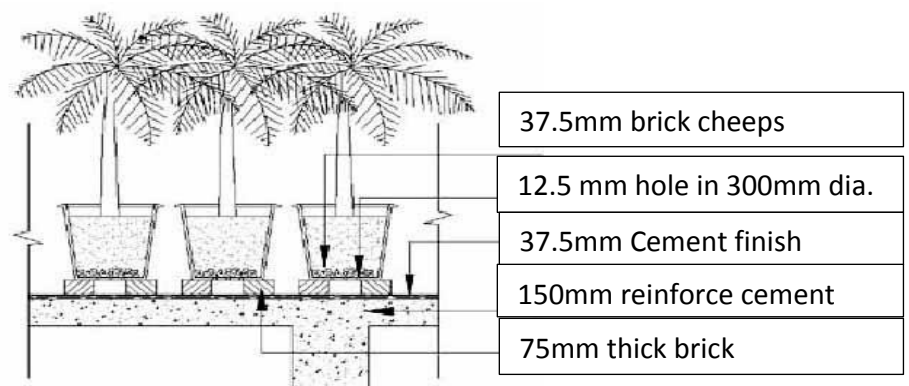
A Typical Rooftop Garden with Pot Plants (R.Rasid, 2009)
